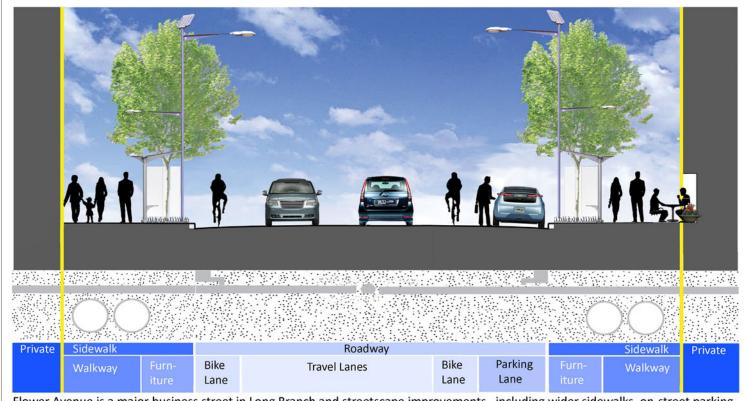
Flower Avenue Cross Section between Piney Branch Road and Arliss Street
